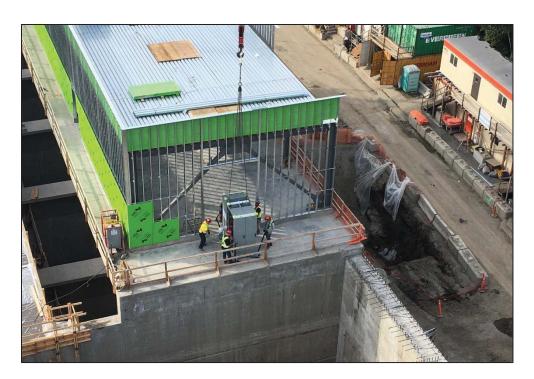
McLoughlin Point Wastewater Treatment Plant- Lifting motor control centres into electrical room.
